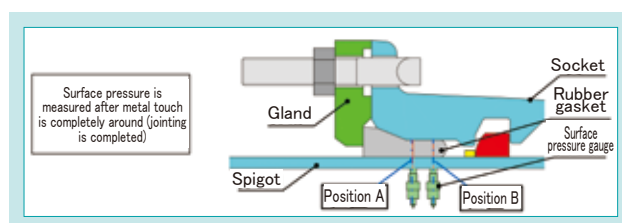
Surface Pressure Measurement Method of the Rubber Gasket
